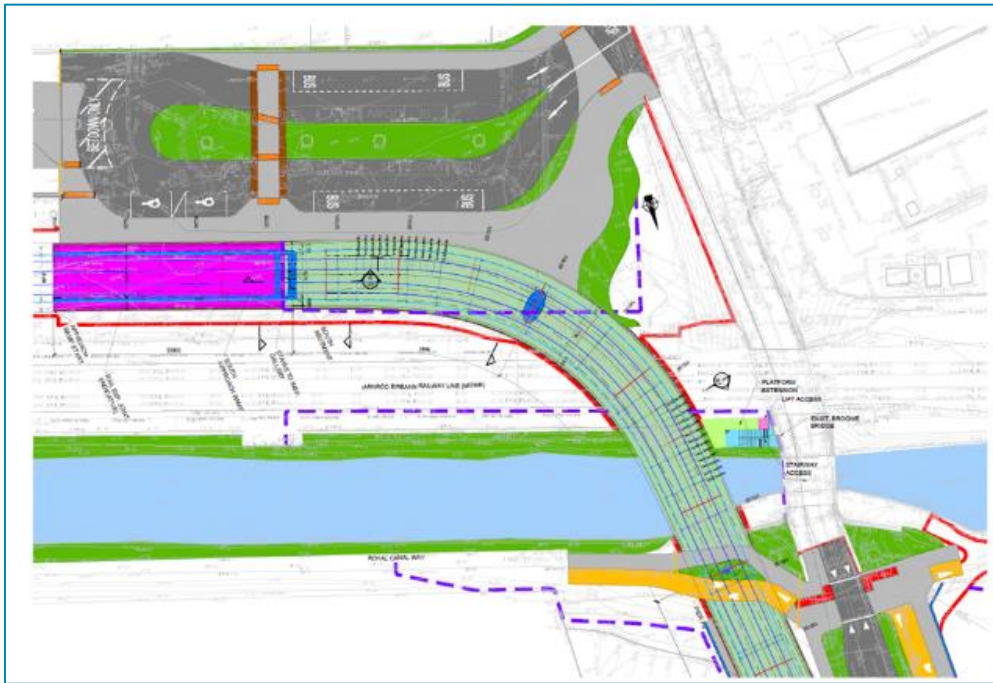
Option 2 New access structure off Hamilton Bridge
